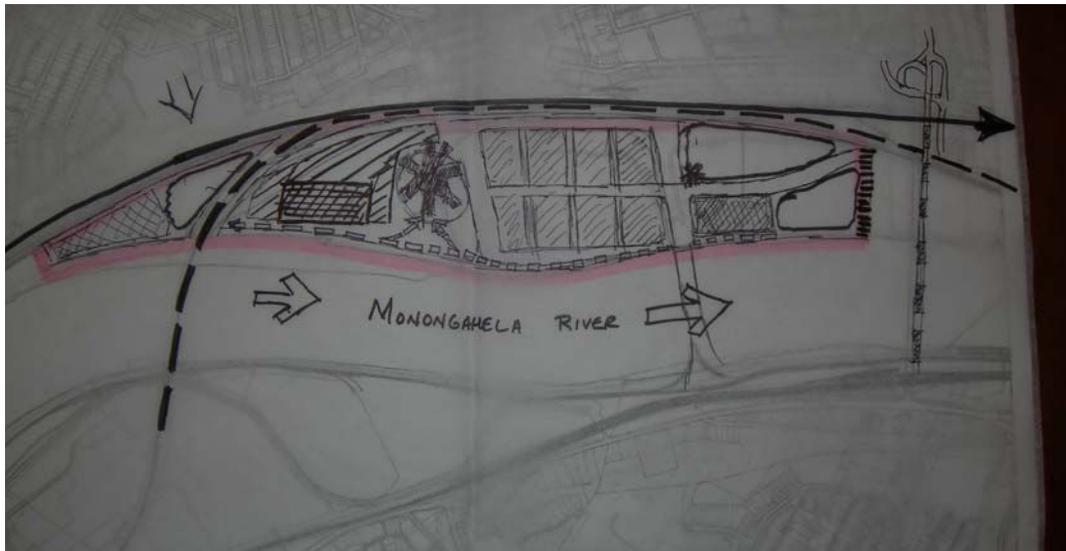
Tracing paper sketch of conceptual site development plan<sup>8</sup>
